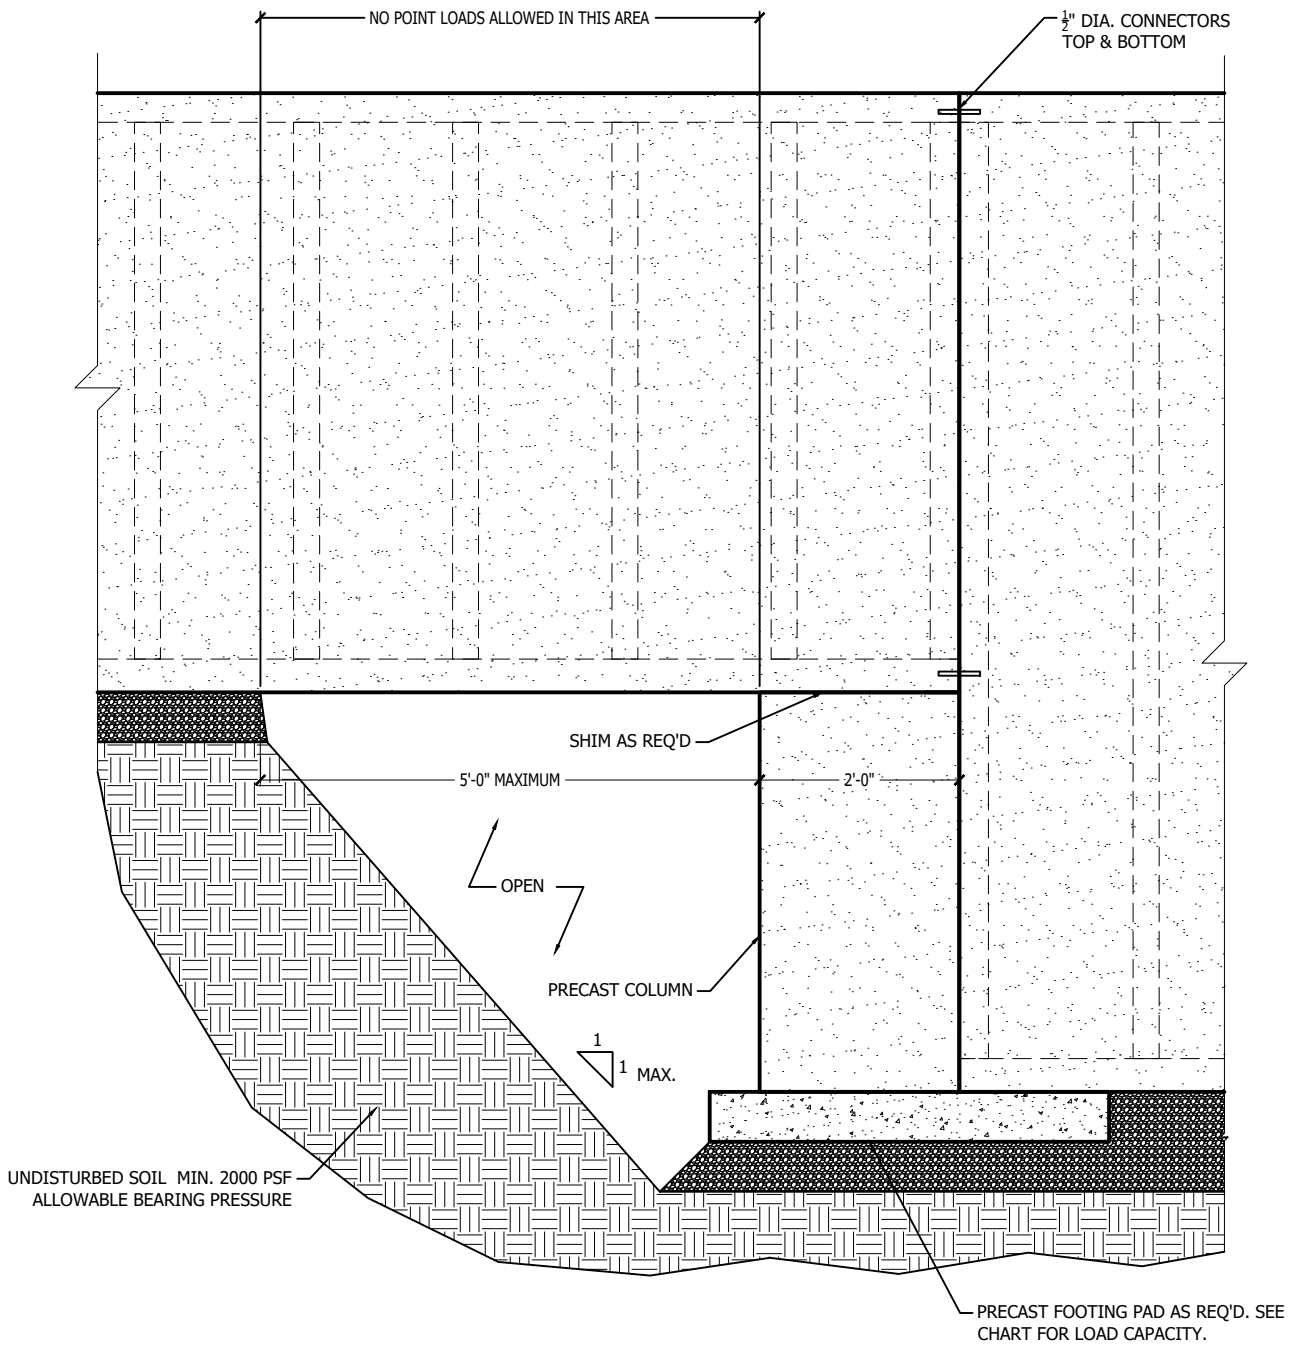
CRAWL WALL TO BASEMENT WALL PARALLEL
